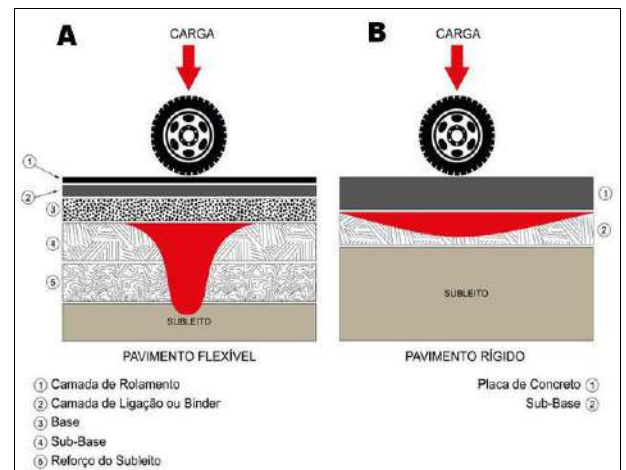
Load distribution: Flexible pavement (A); Rigid floor (B).
